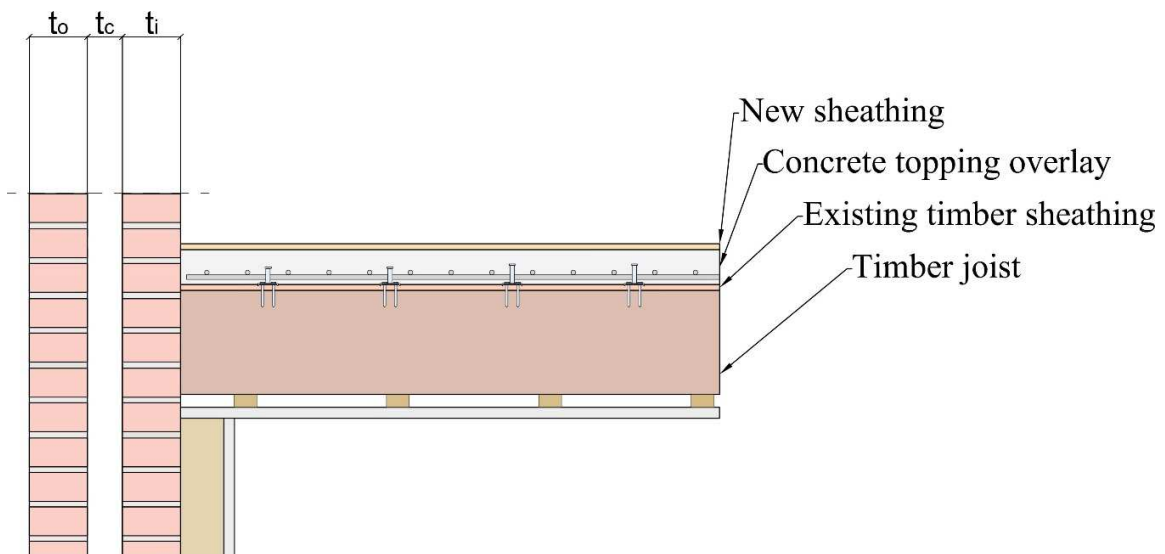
Detail of Cavity Wall and Timber Diaphragm
